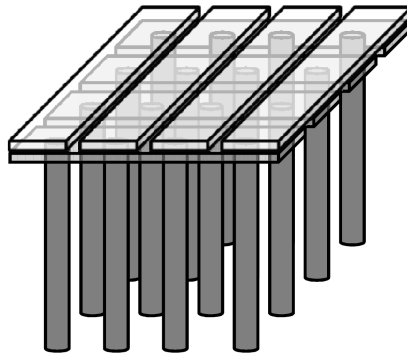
The pile-cap model, consisting of two layers of beams/columns
